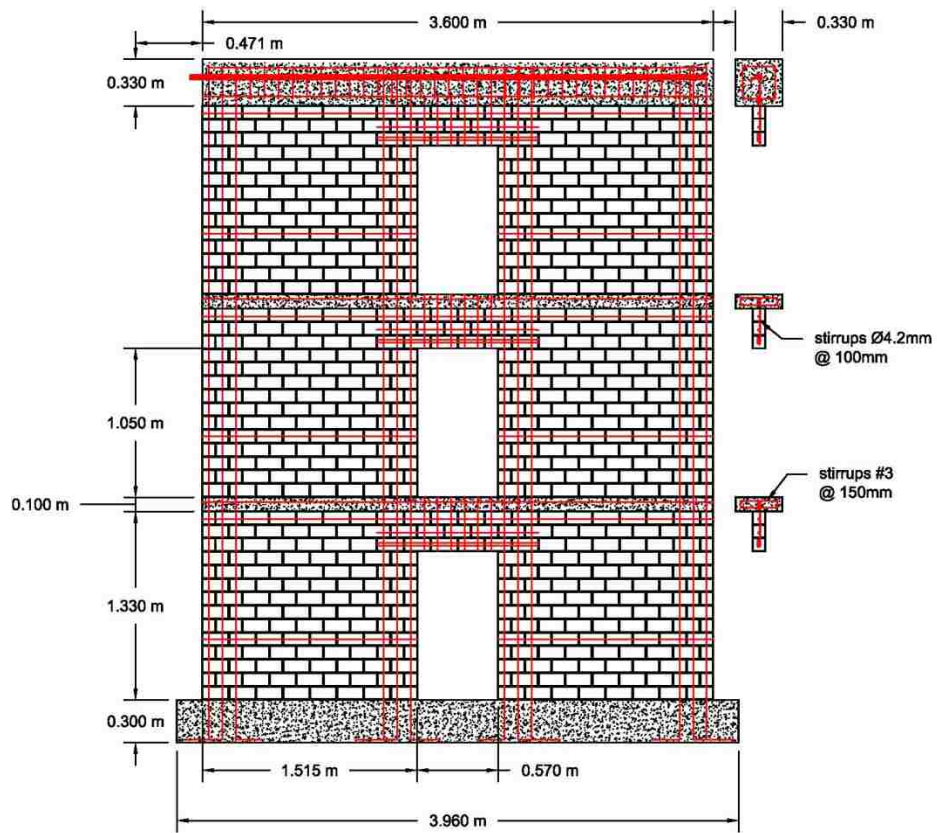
Geometry and Reinforcement Details of Walls with Door Openings
